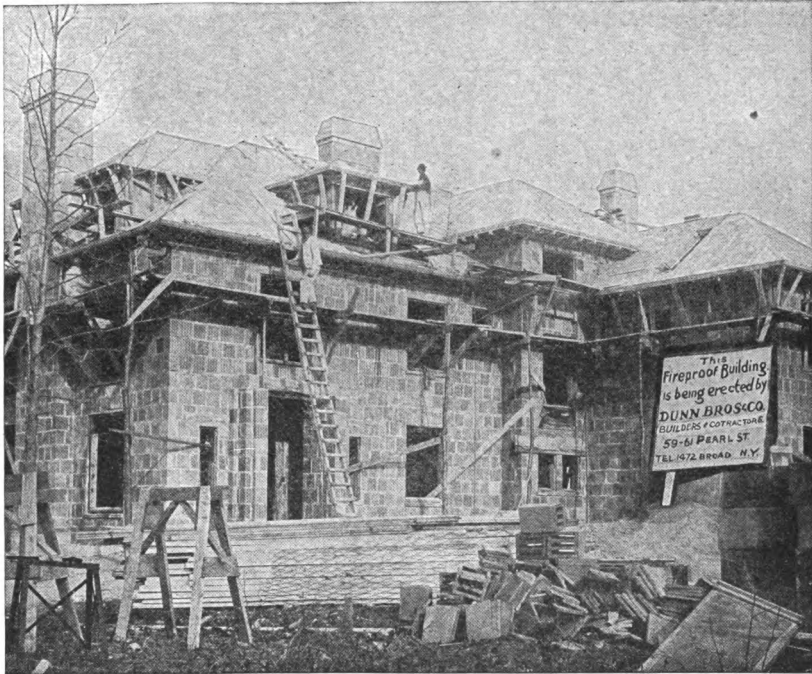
A Tile Fireproof House, Roof, Walls, Floors and All of Hollow Tile
